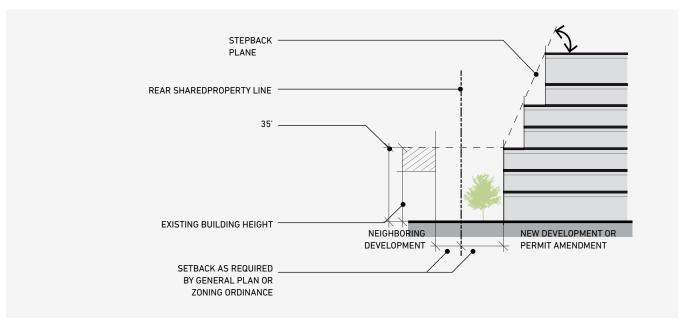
Lot Line Stepback Plan Diagram
